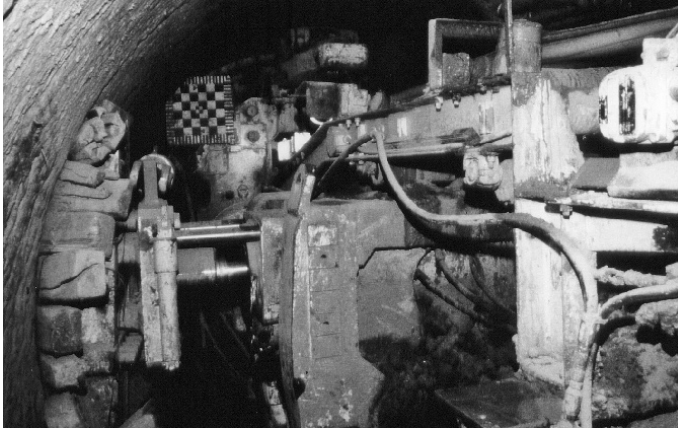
Rosen-berg access tunnel with enlargement of the bearing area of the bracing units.
